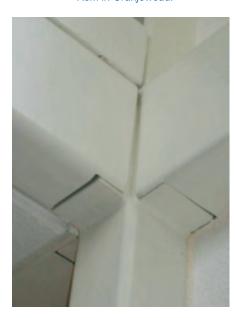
(Above & right) Smart House, Rotterdam using Square & Rectangular Hollow Sections with light steel infill walls & floor joists Two façades systems are used – one is for heavy weight elements such as terracotta, and the other is for lightweight elements such as insulated render. Both cladding systems use an adapted steel sub-frame, which provides for a wide range of design solutions.
